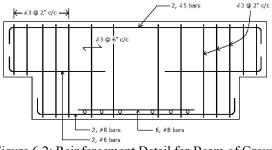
Reinforcement Detail for Beam of Group G-2 (12" x 9")
